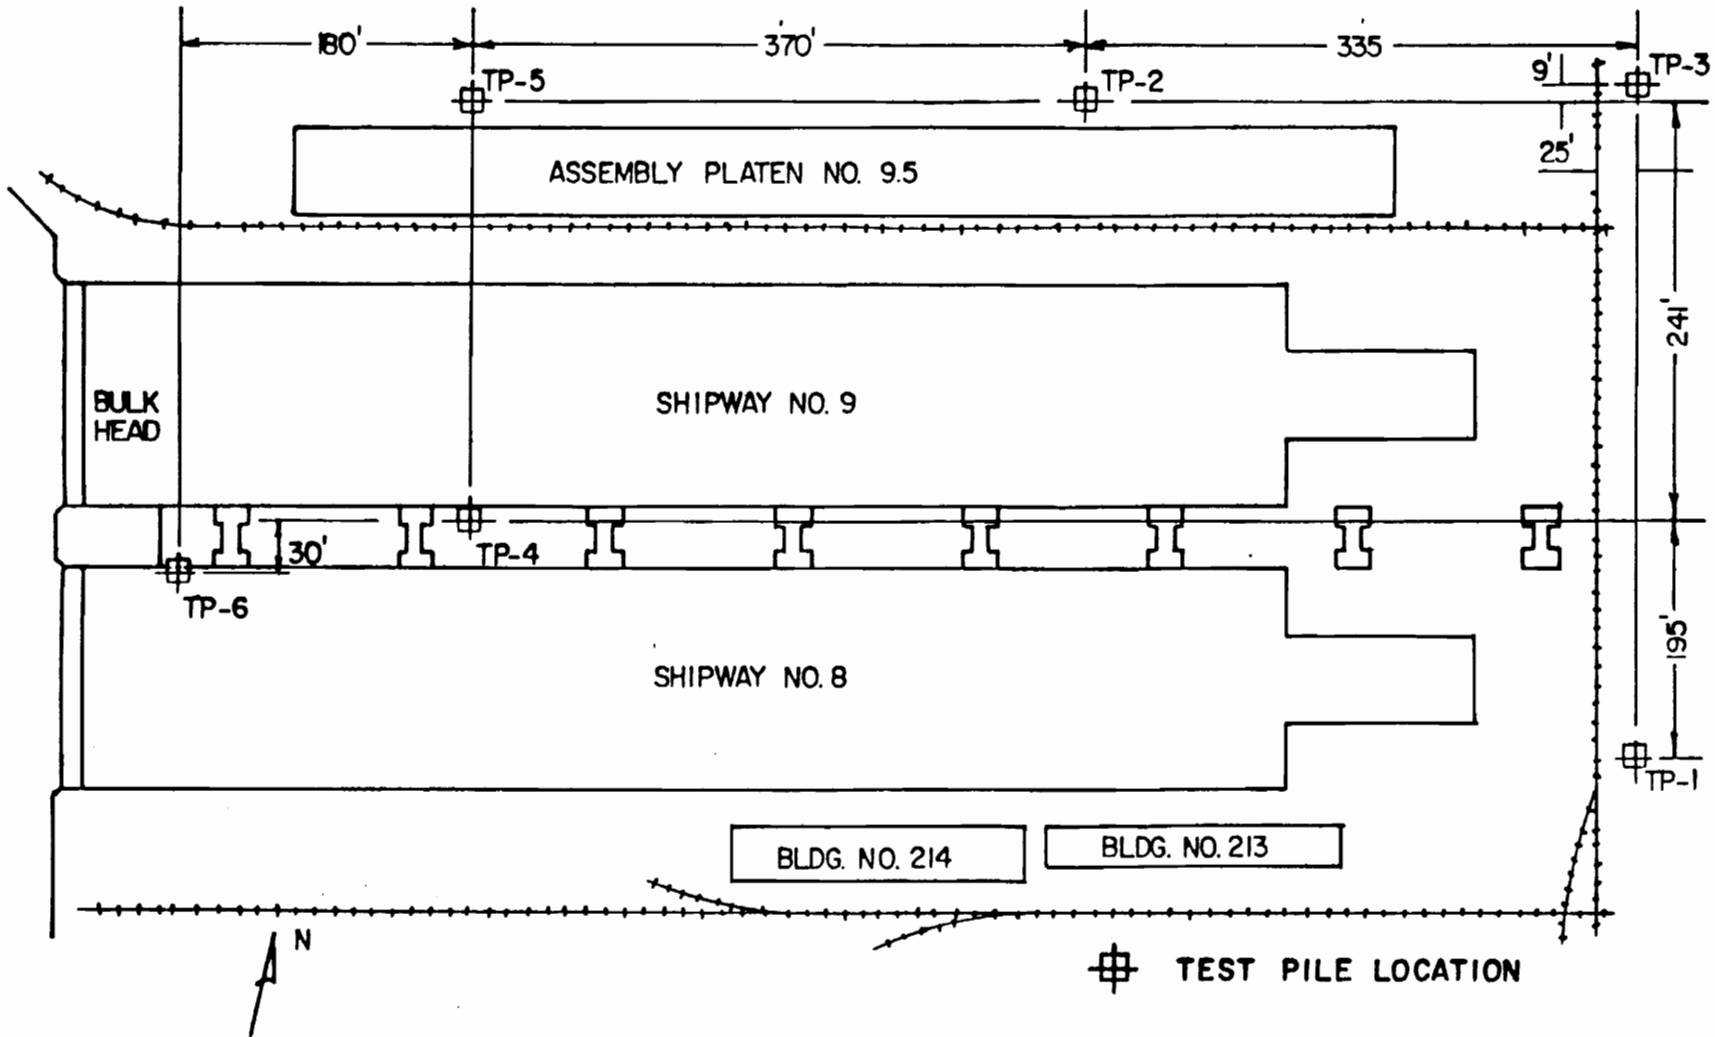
TEST PILE LOCATION PLAN, LANDLEVEL SHIPBUILDING FACILITY
